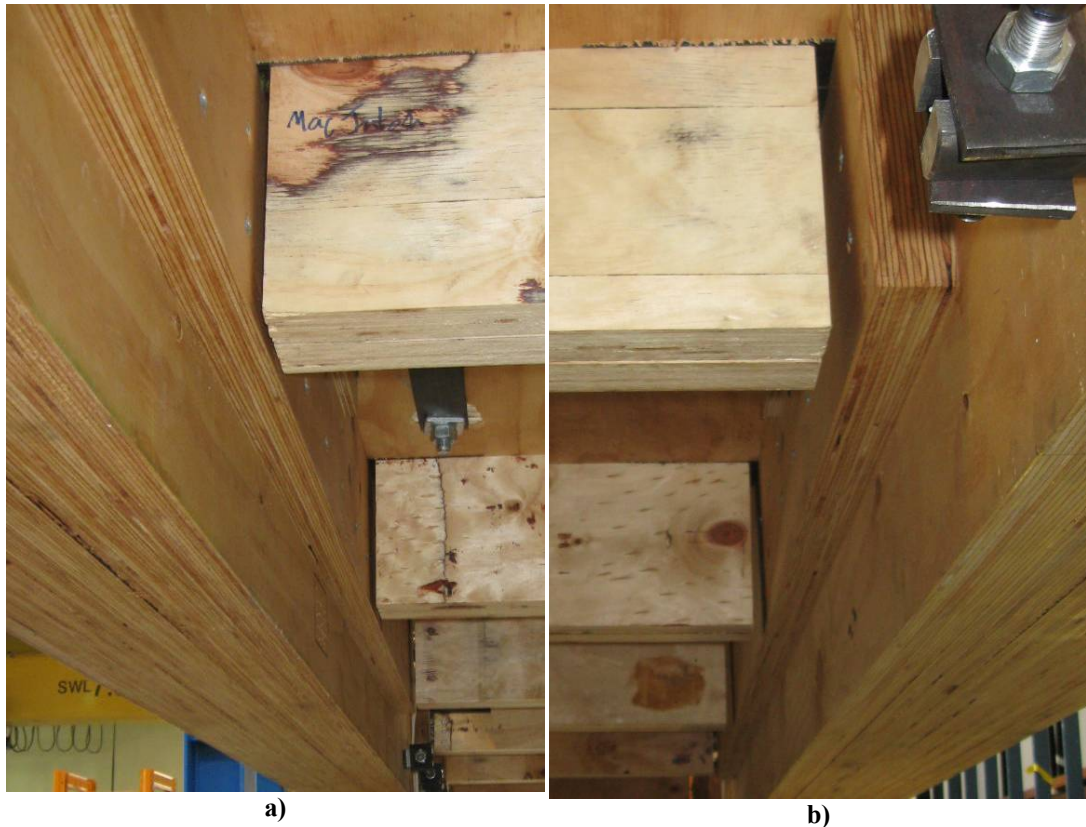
Floor joist supports at negative 2% Drift: a) South edge b) North edge
